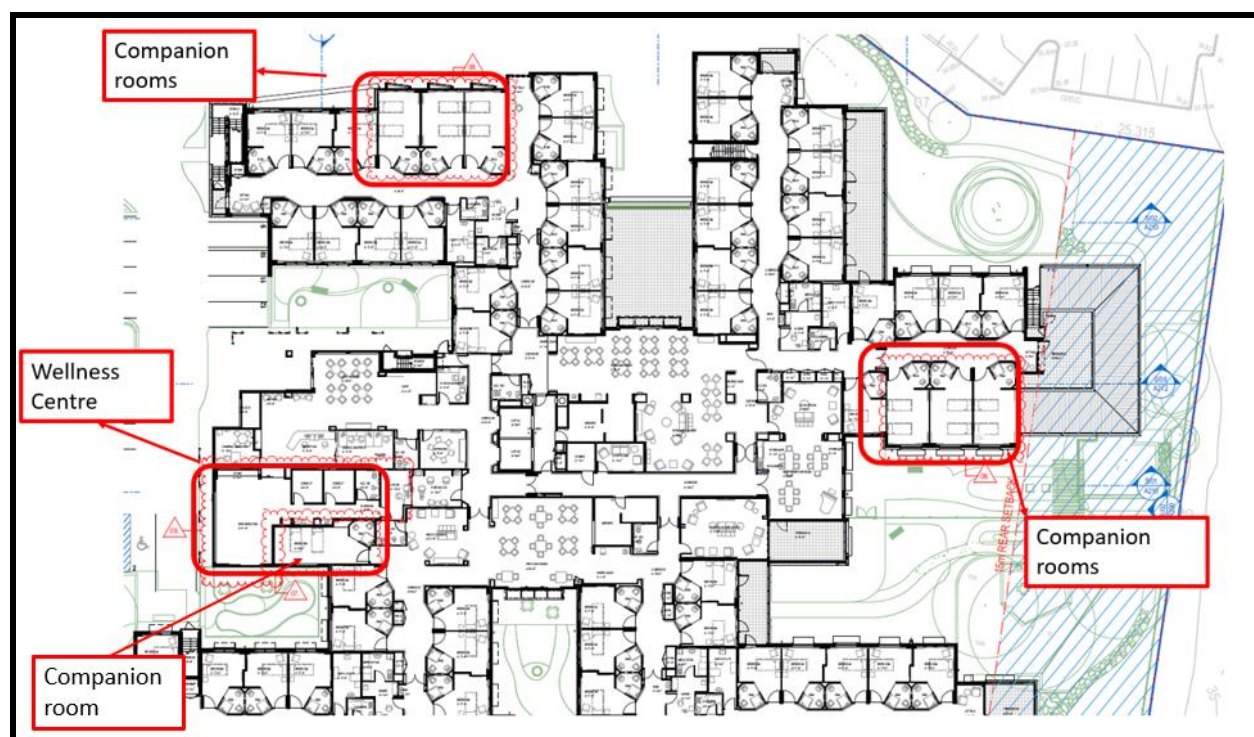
Proposed modifications to ground floor plan (Source: Calder Flower)
